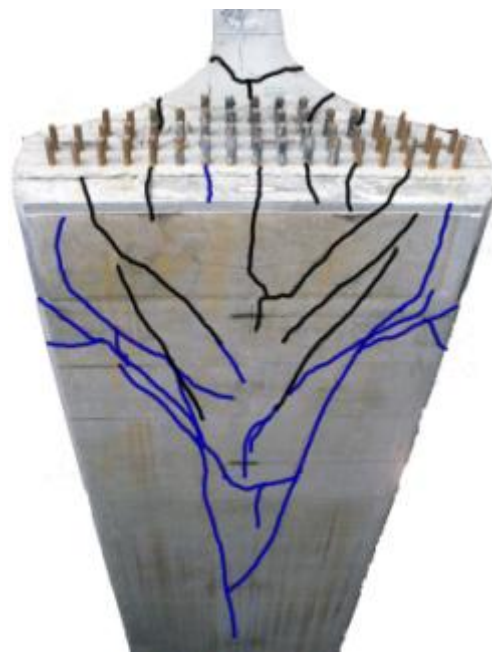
Longitudinal splitting cracks on bottom of specimen FN (release cracks shown black; final cracks shown blue)
